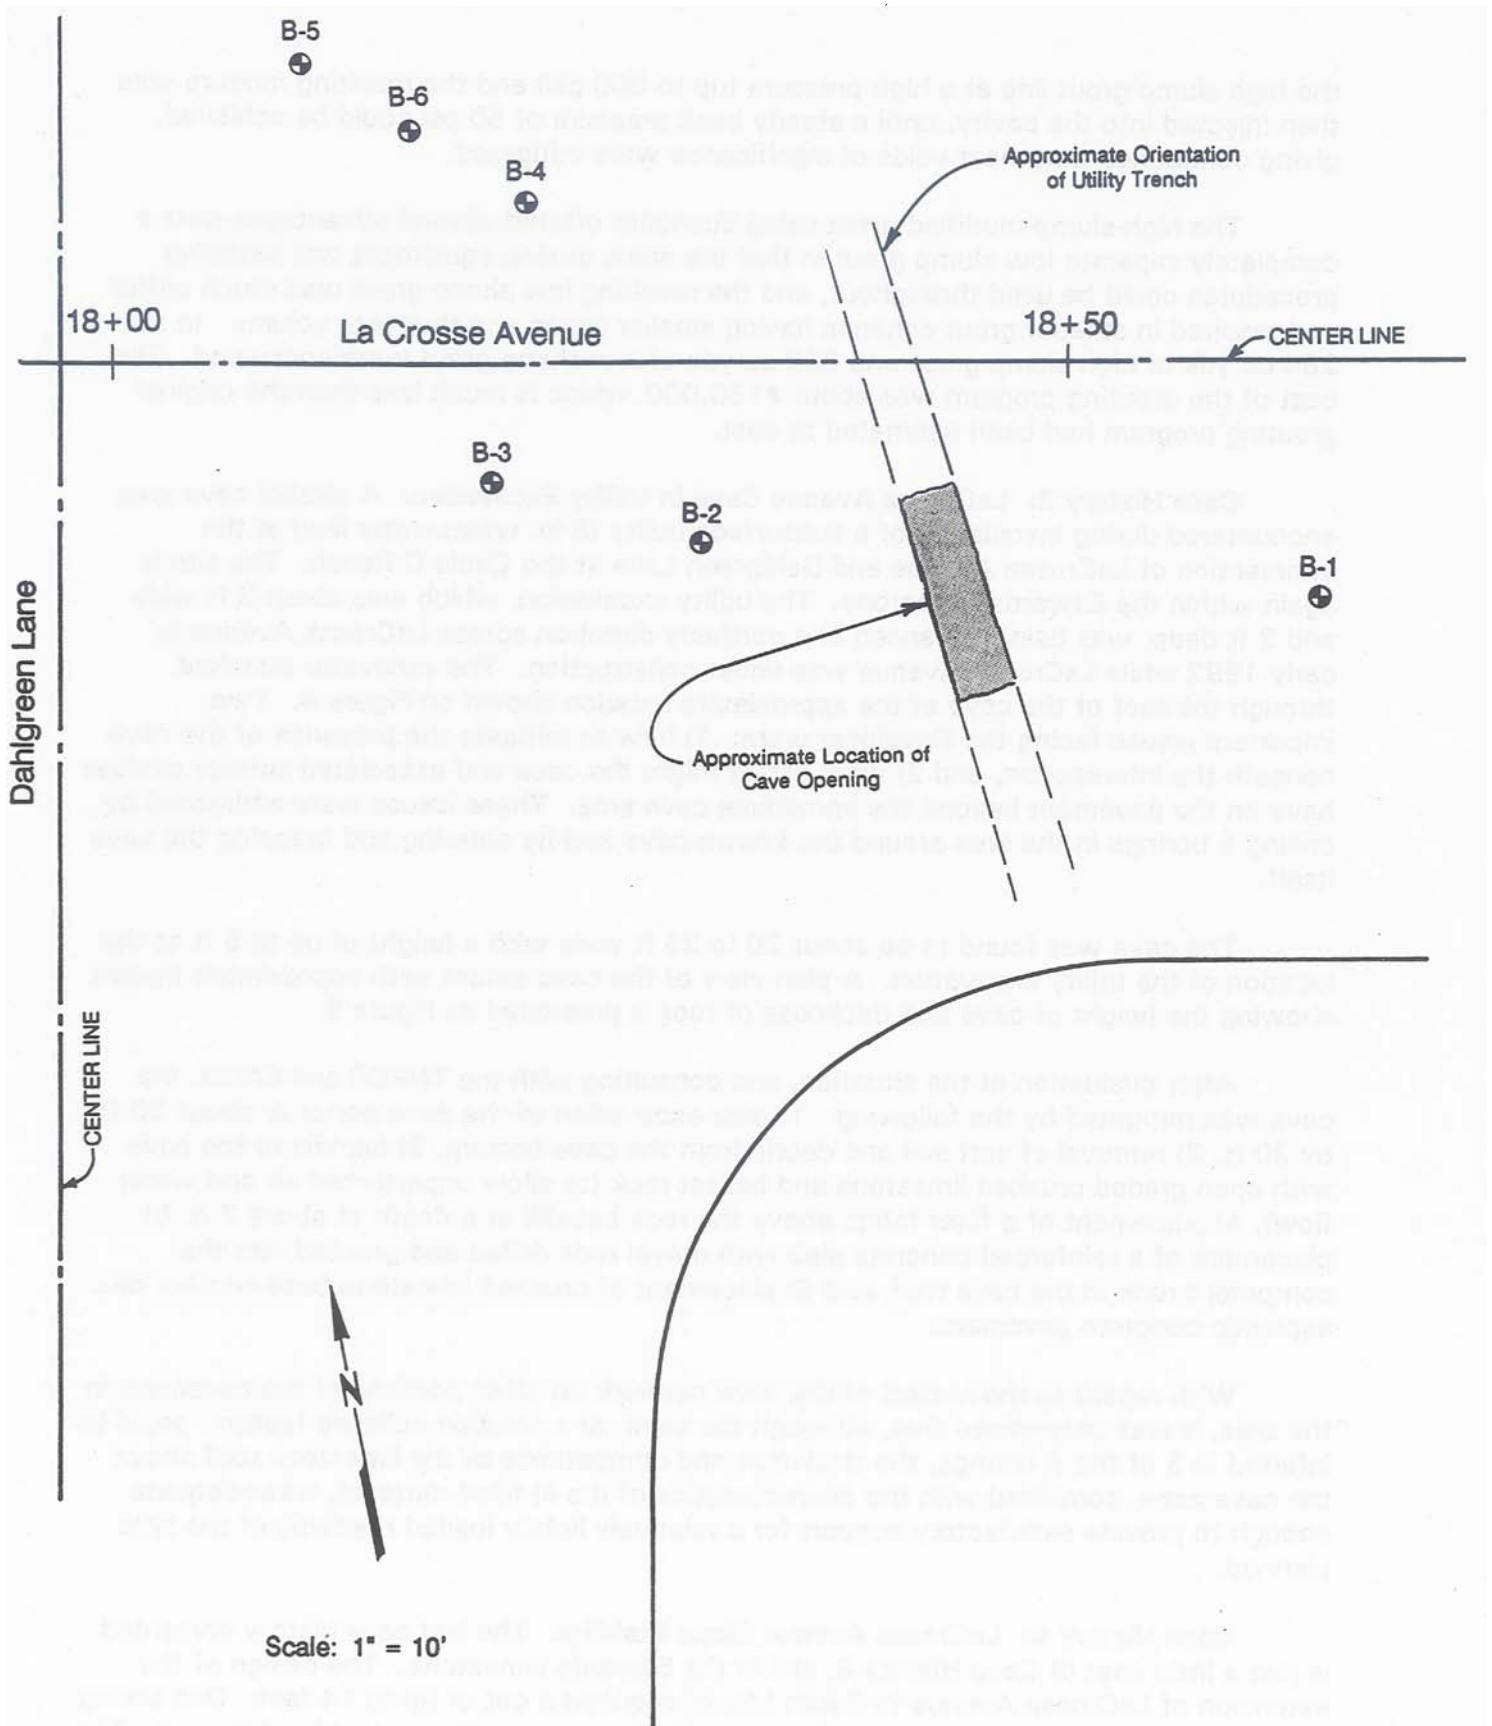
Plan Of Borings, La Crosse Avenue At Dahlgreen Lane
